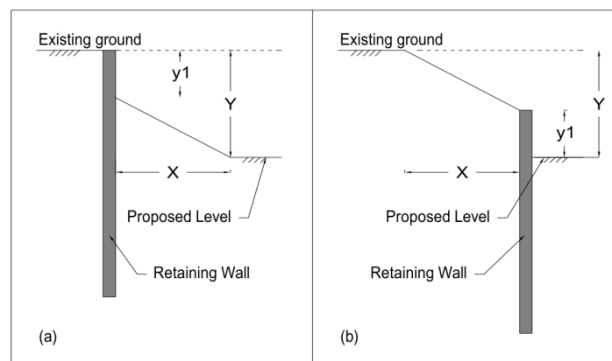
Different configurations for retaining wall on a slope. (a) passive berm and (b) wall at the bottom of the slope with backslope
